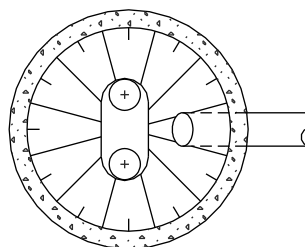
Circular wet pit with sloping walls and minimized horizontal floor area (submersible pumps shown for illustration)
